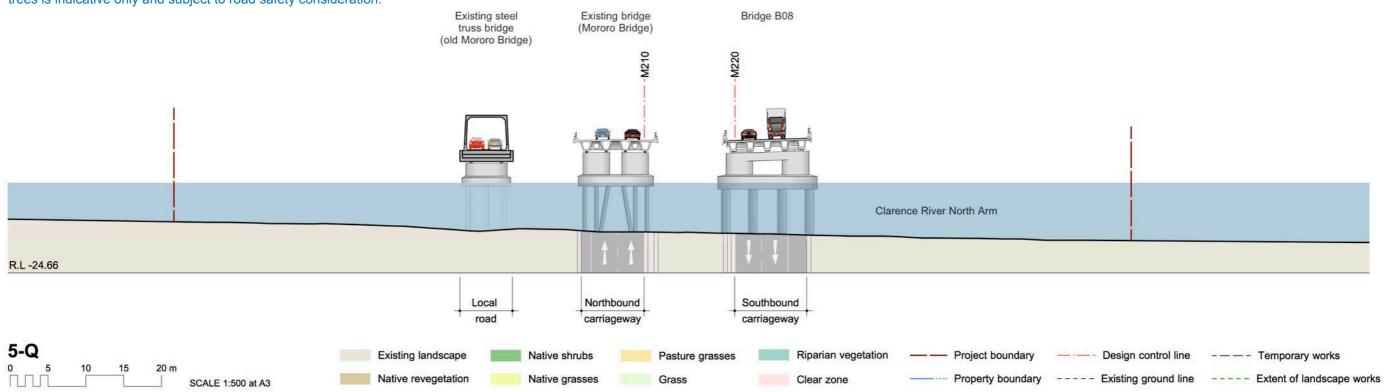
Section 5-Q at Bridge B08 – Southbound Bridge over Clarence River North Arm
